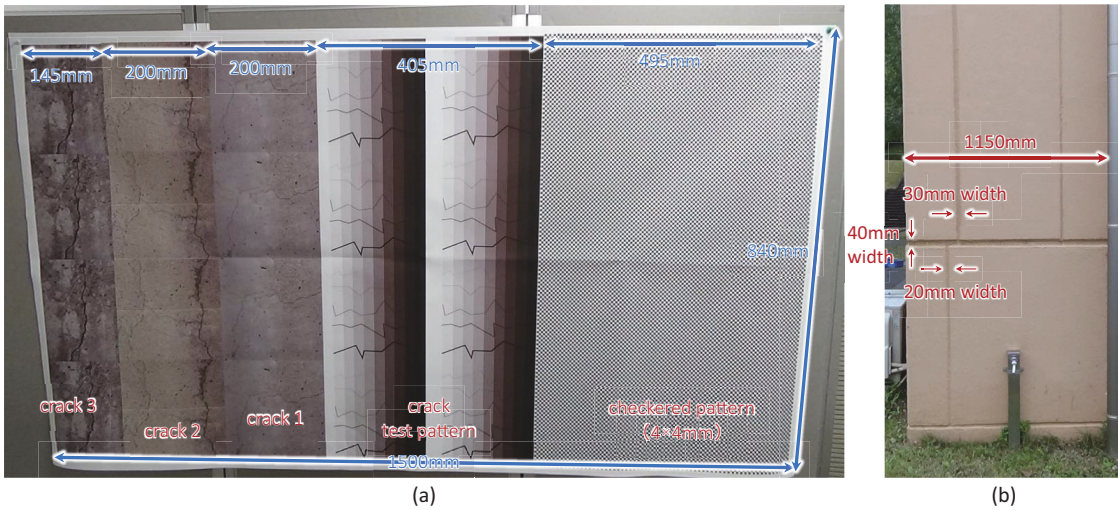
Overview of shooting objects; (a) test patterns and (b) a concrete wall.
